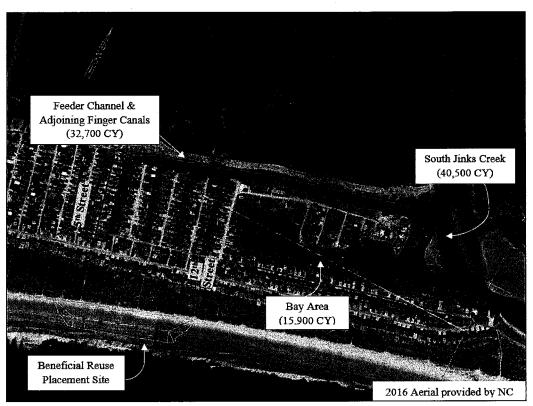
South Jinks Creek, Bay Area, & Feeder Channel Site Plan
